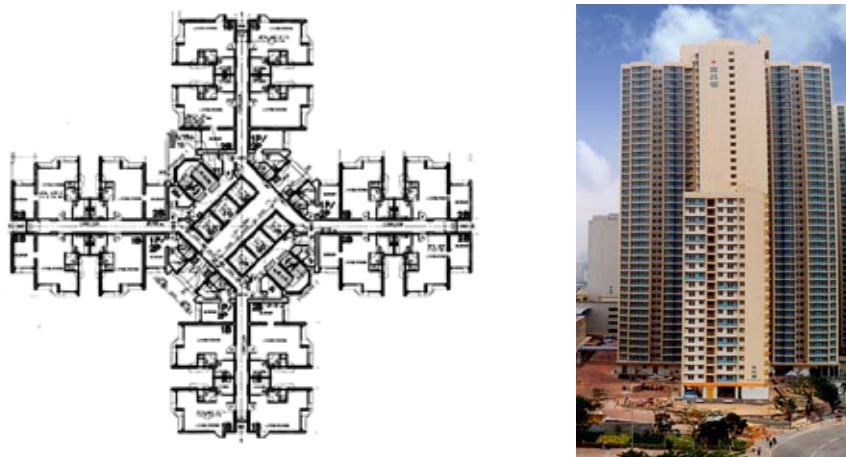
Typical floor plan (left) and the appearance (right) of the New Harmony Block (Option 2)
